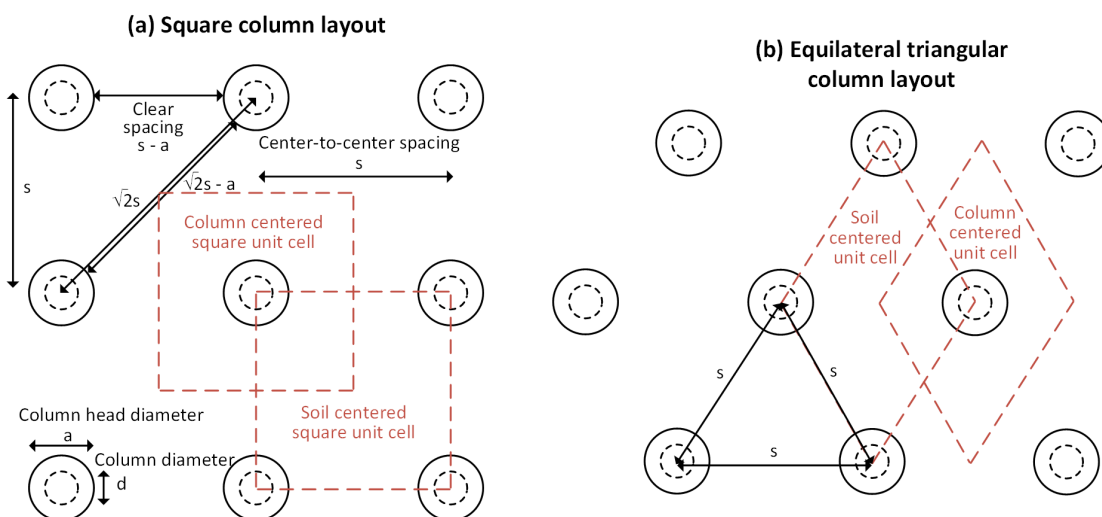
(a) Square column layout (b) equilateral triangular column layout and unit cells
